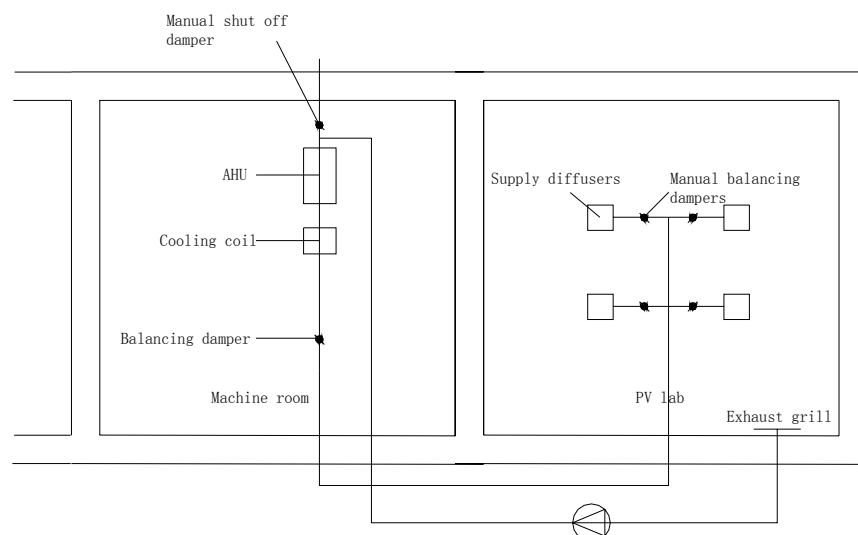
Schematic layout of mixing ventilation system for PV lab
